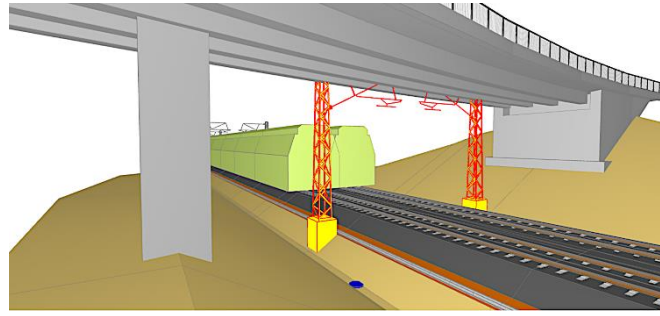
An existing mast structure and a new road bridge: a hard clash or a 4D clash?
